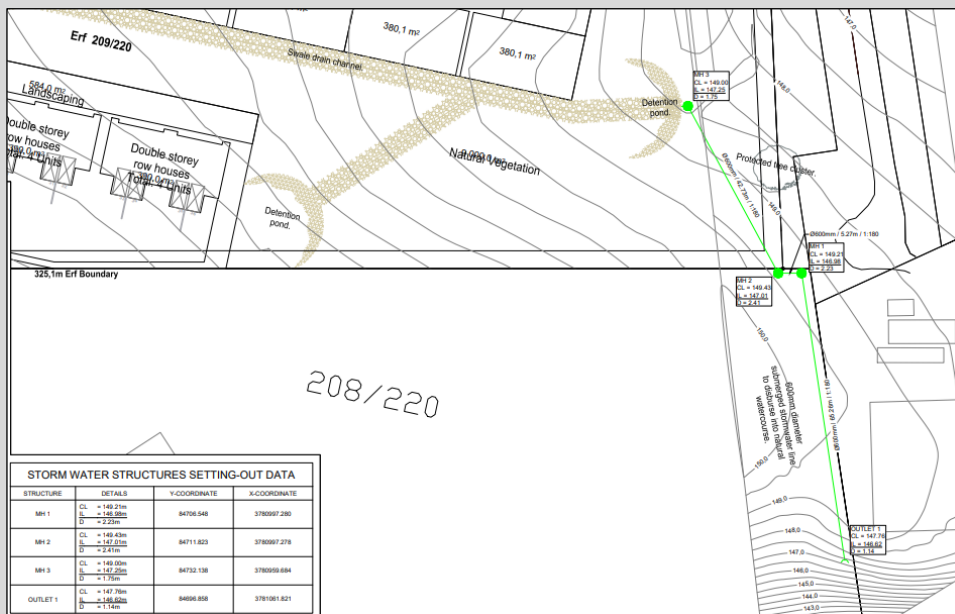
Proposed stormwater outfall line layout (Element Consulting Engineers, 2024).
